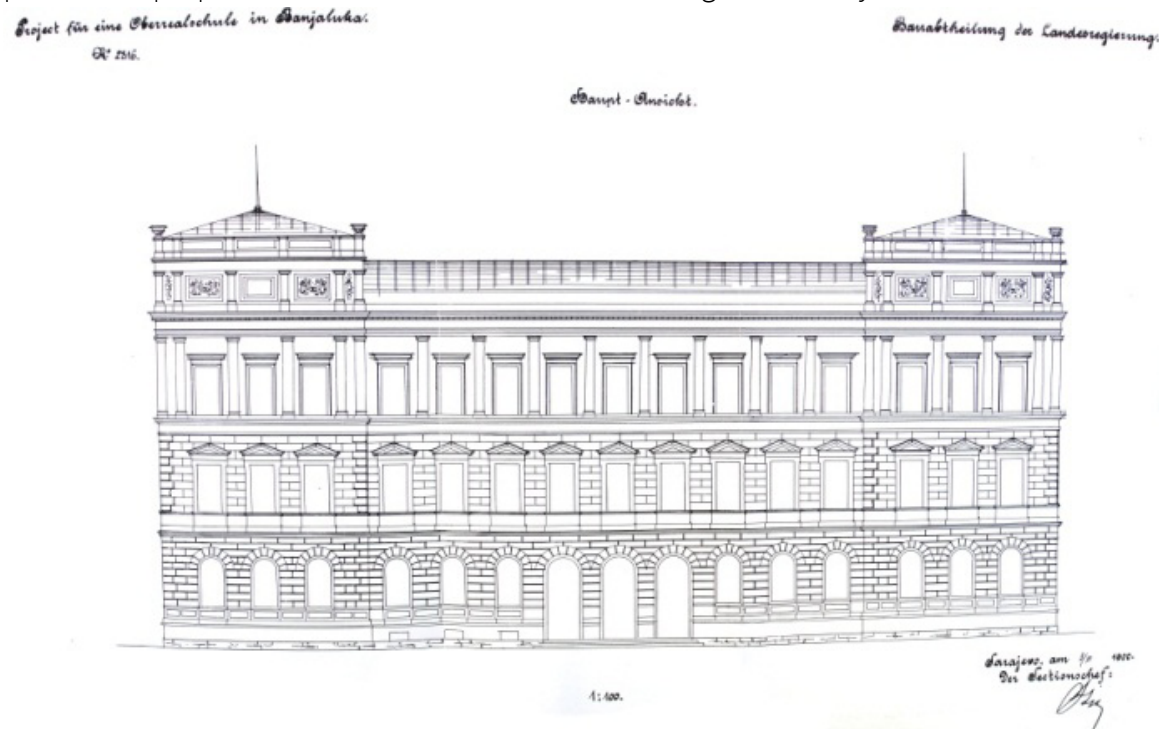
Real Gymnasium in Banja Luka; elevation view from south, main façade.
